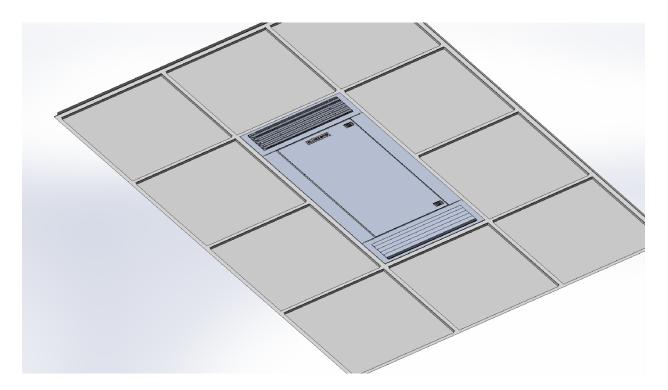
Rendering of the Bluezone 450 Installed into a Ceiling Mount Kit
